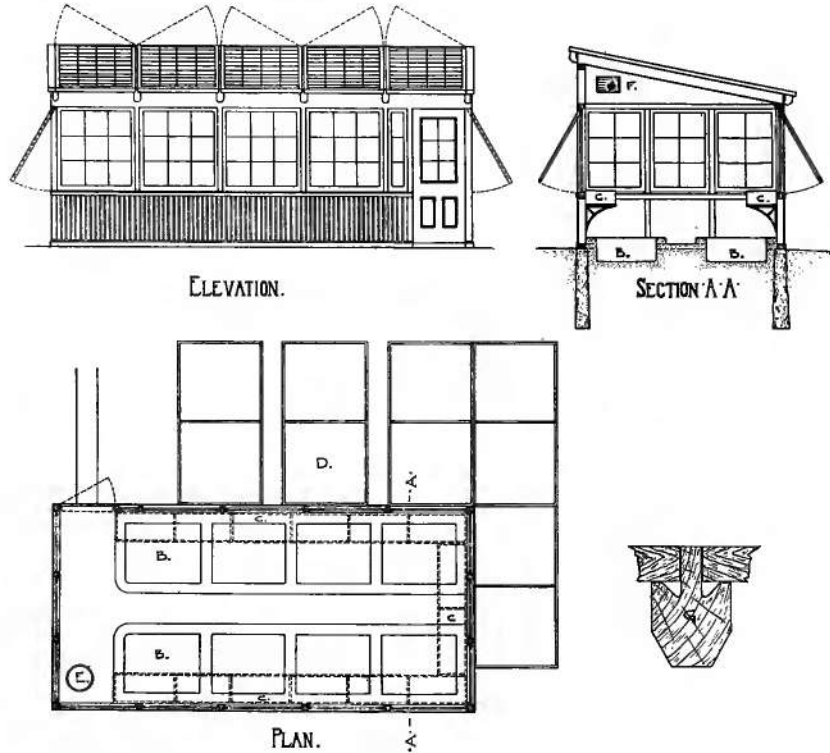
Elevation, plan and section of a Greenhouse for Goldfish propagation.
